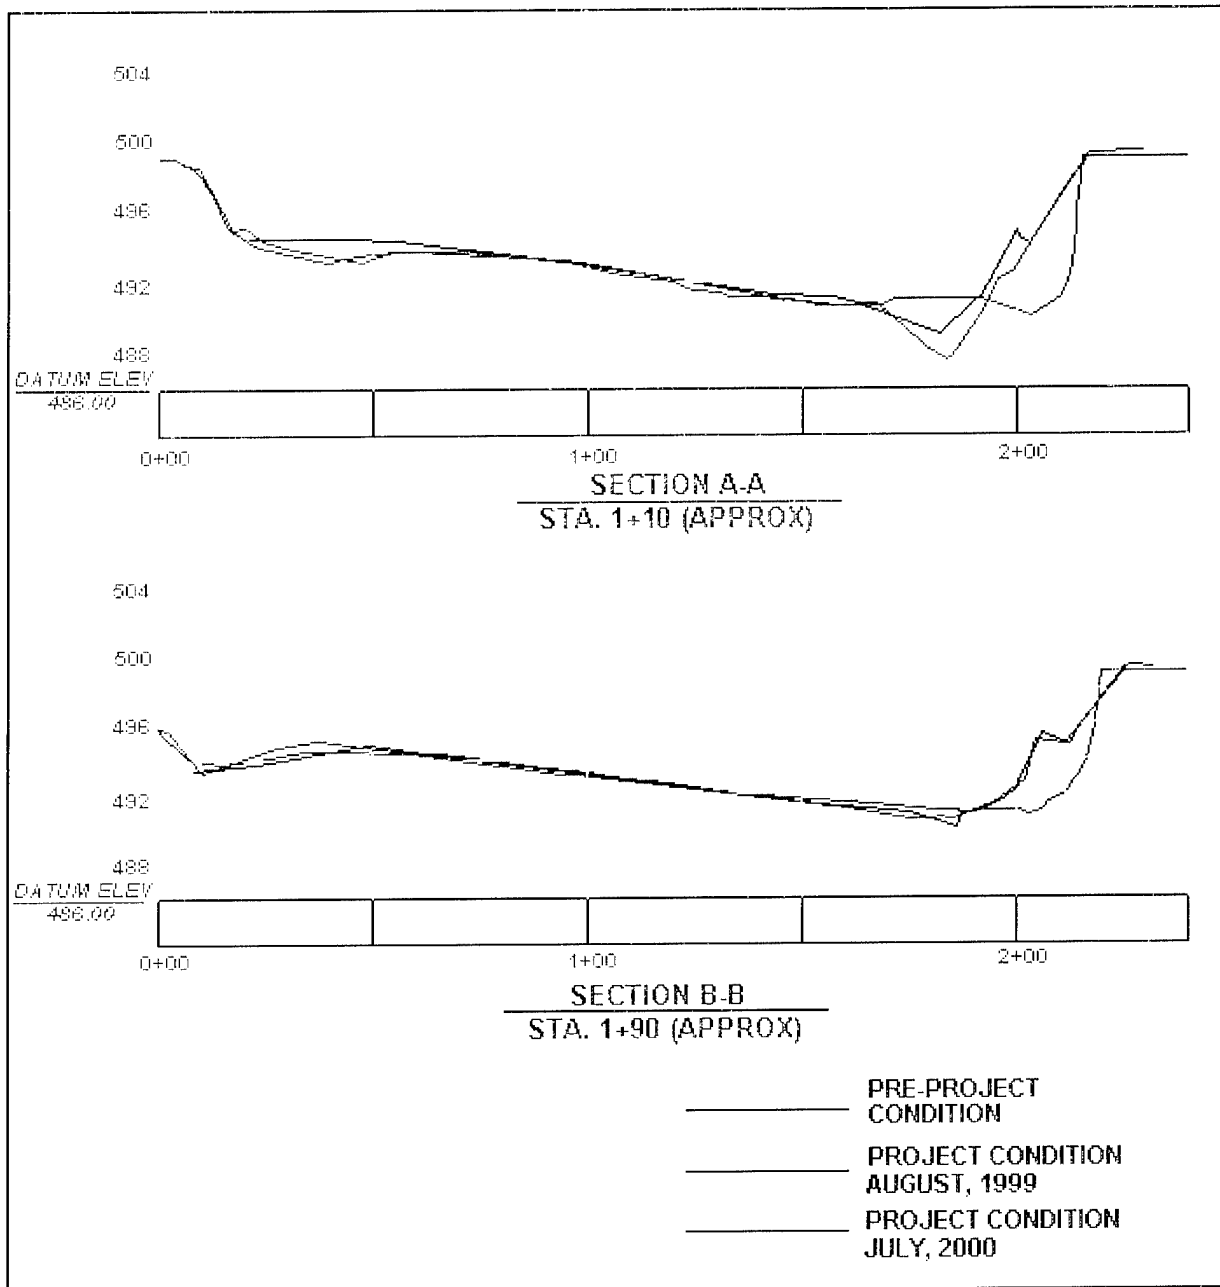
A-A and B-B cross sections as though looking upstream. Note how thalweg has shifted to the left and sediment has accumulated on the right bank, the eroded bank of the bendway
